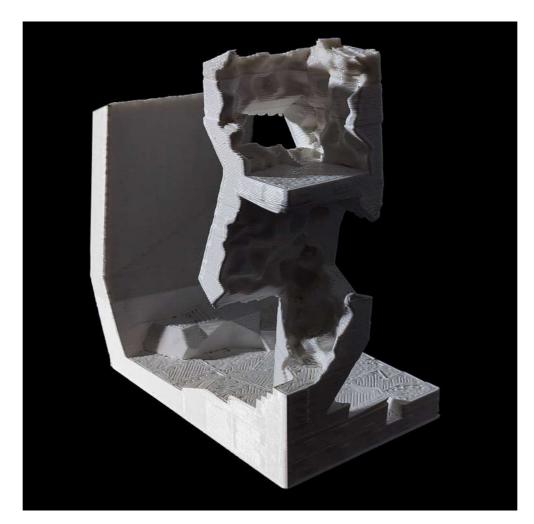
DETAIL SECTION - TYPICAL STRUCTURAL STRATEGY
